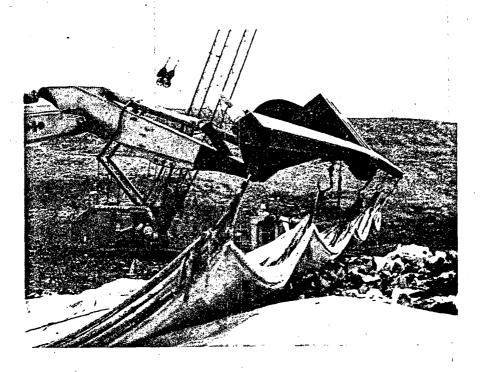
Leading edge of panel being lowered onto working face by excavator equipped with lifting bar.
